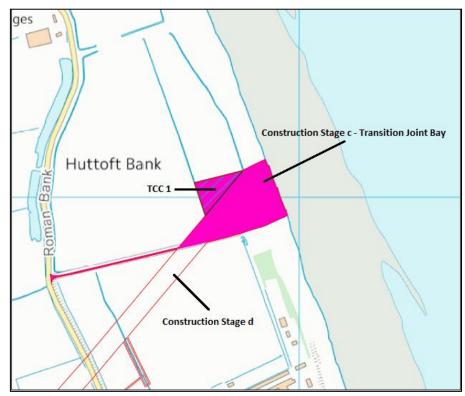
Stage c (above) where Murphy will prepare the area for construction of the Transition Joint Bay
